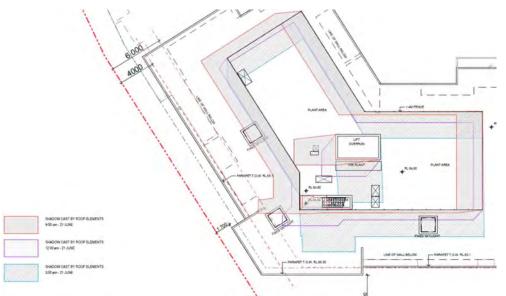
Shadow cast by building elements above 50m (Source: Zhinar Architects)
